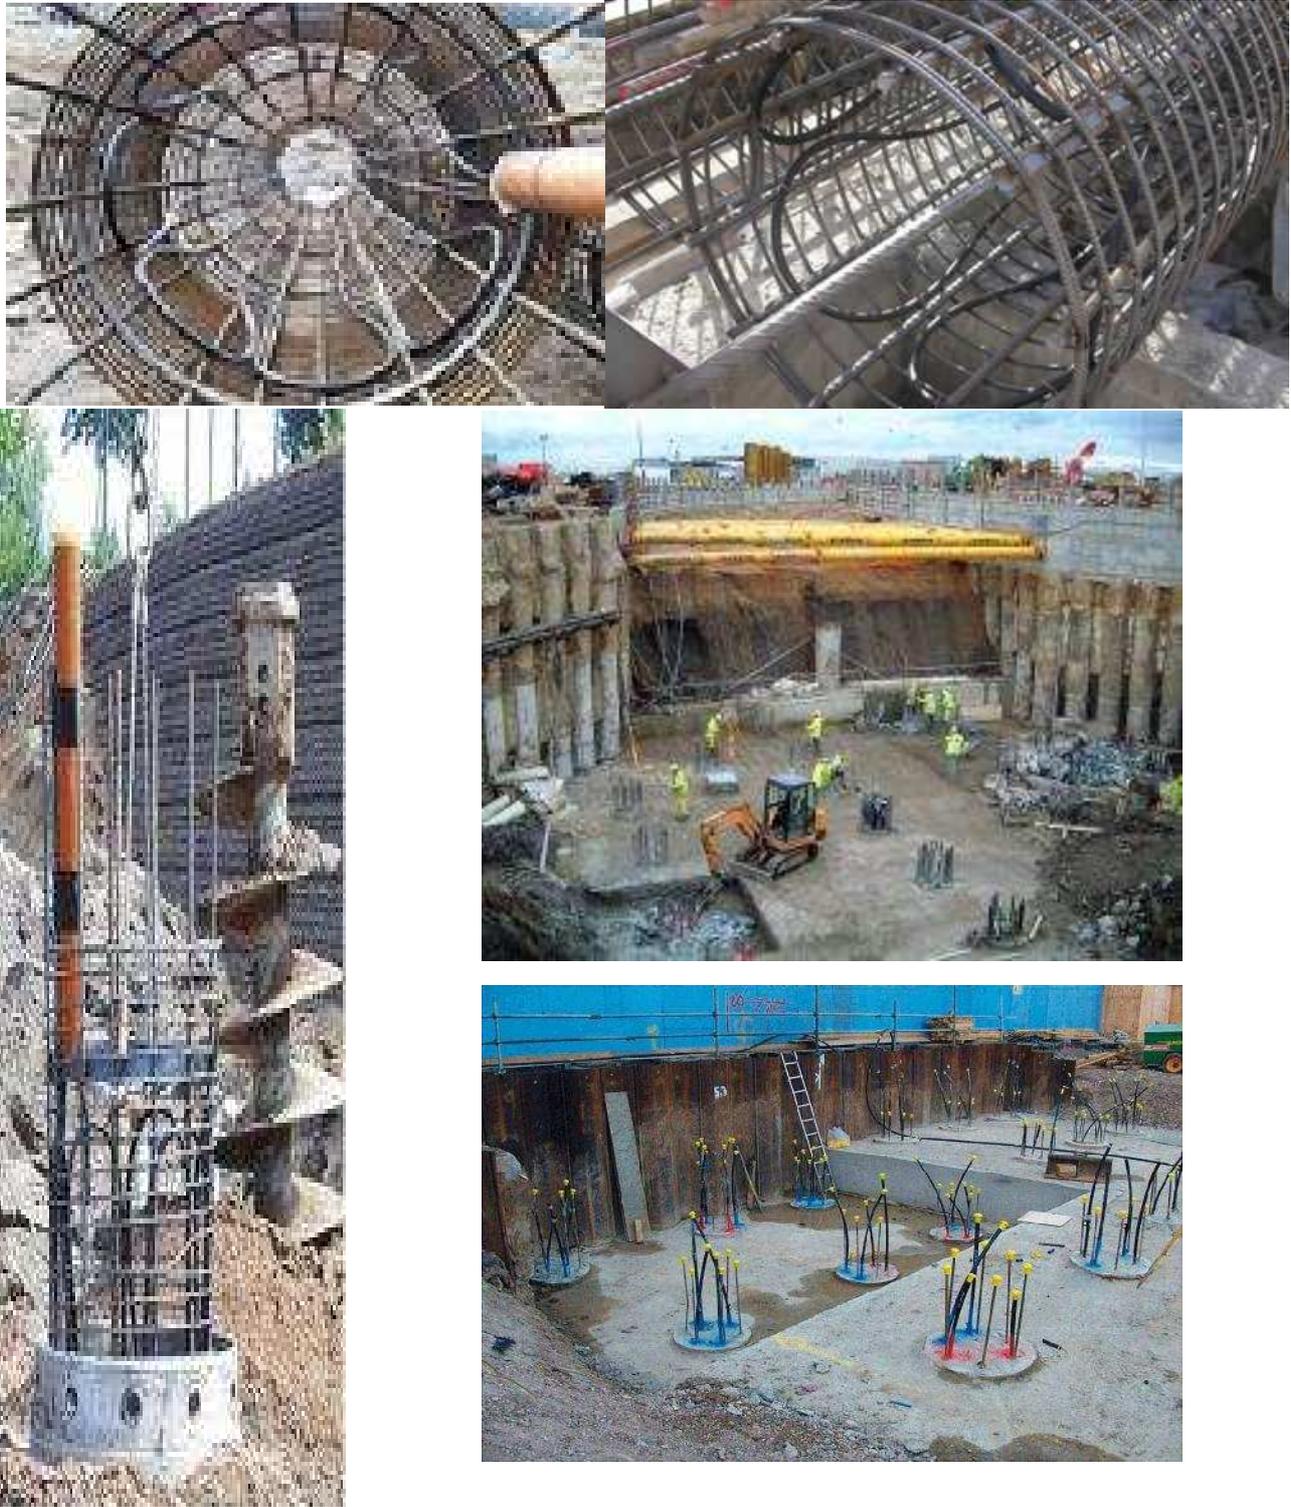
Executive phases of the installation of piles foundations of a building.
